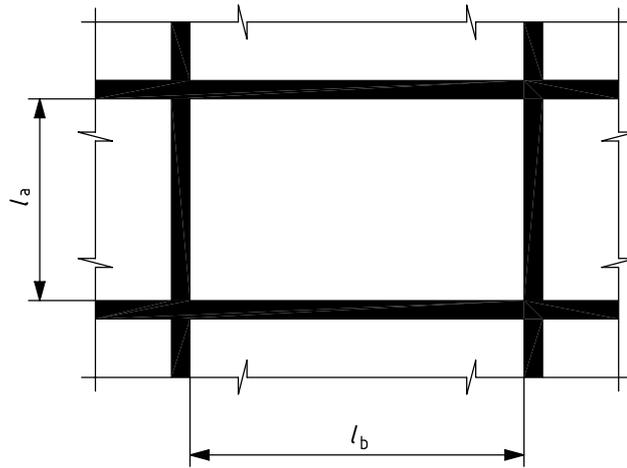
Central panel of two-way slabs supported on girders, beams or structural concrete walls
